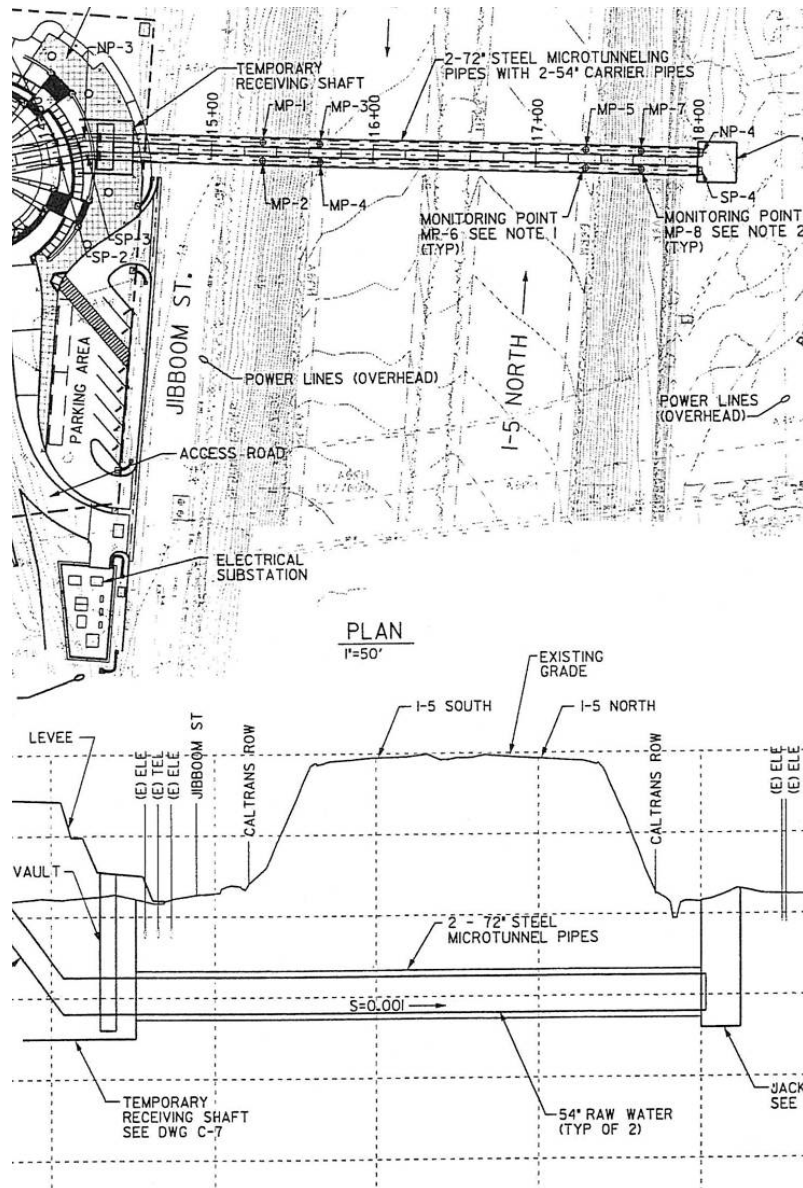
Plan and Profile of the Sacramento Intake Project Microtunnels Beneath Interstate-5 (CH2M Hill, 2000)
